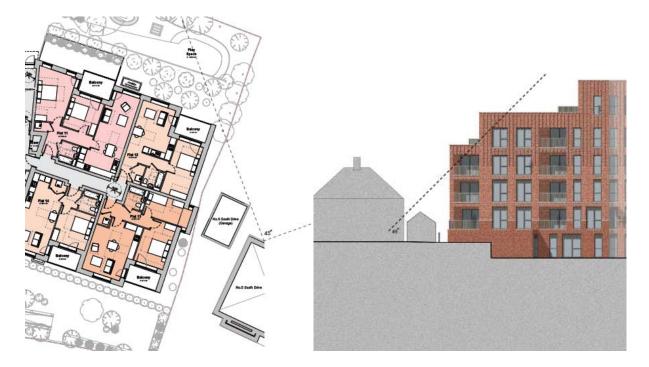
45 degree line to 5 South Drive in plan and elevation
